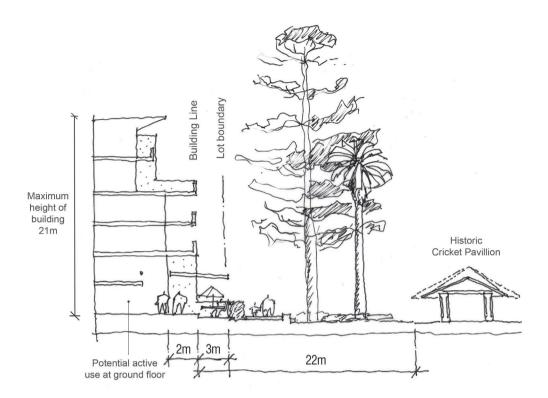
Lot F3 and Open Space 3 Section
